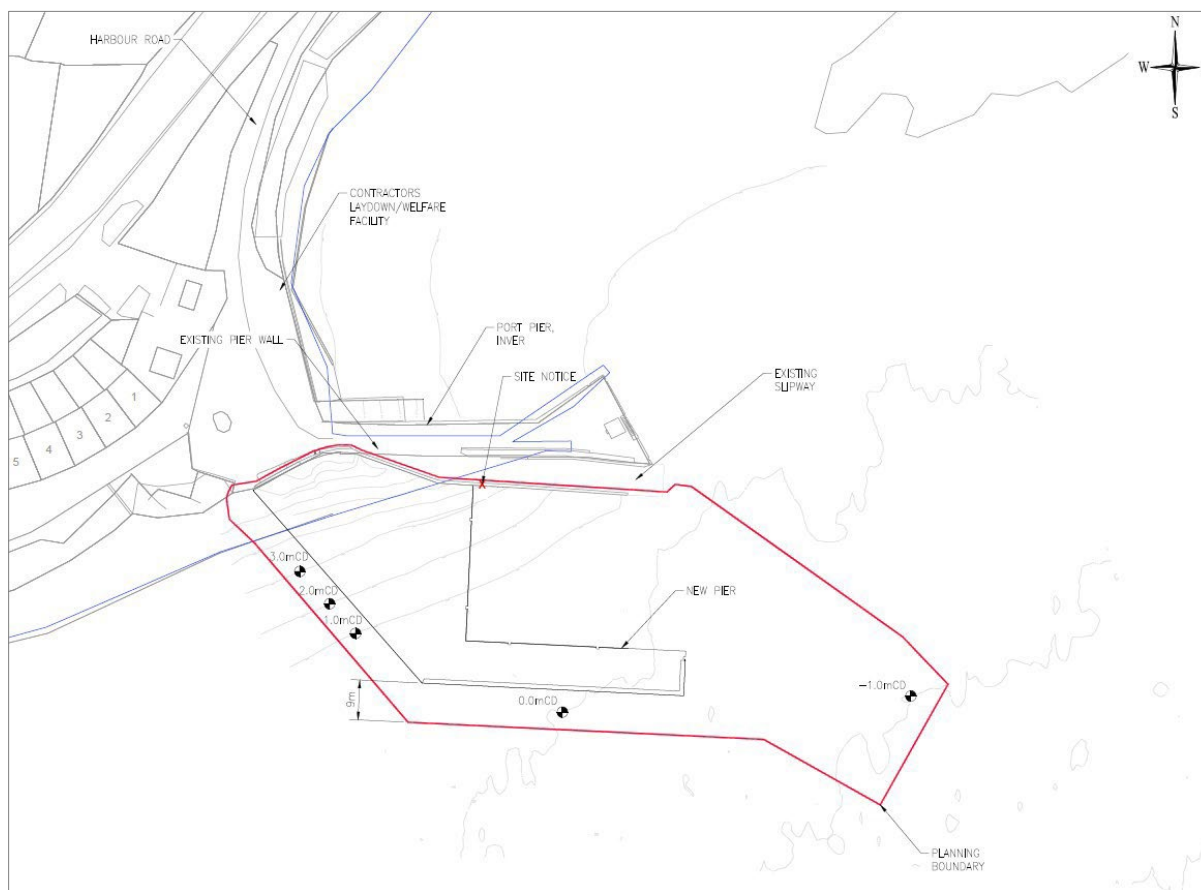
Proposed extension layout and site boundary to include dredging (AYESA 2025).
